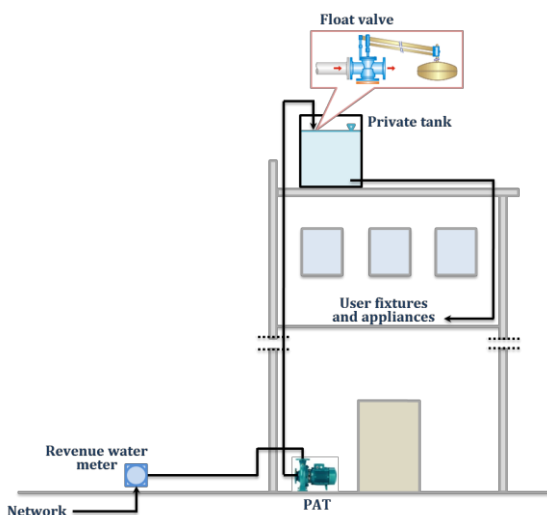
A schematic of the modelled system considering the PAT installation with a roof tank
